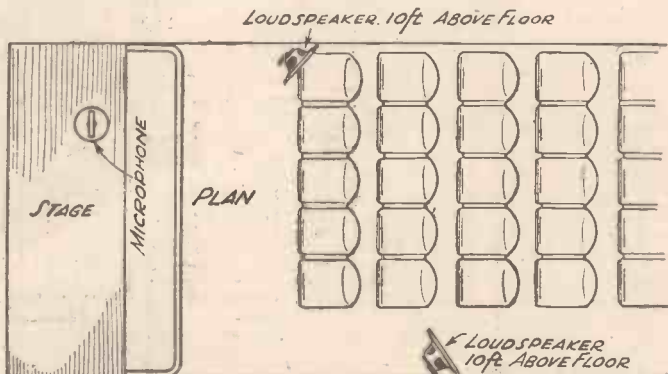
A much better arrangement which provides better diffusion of sound.
